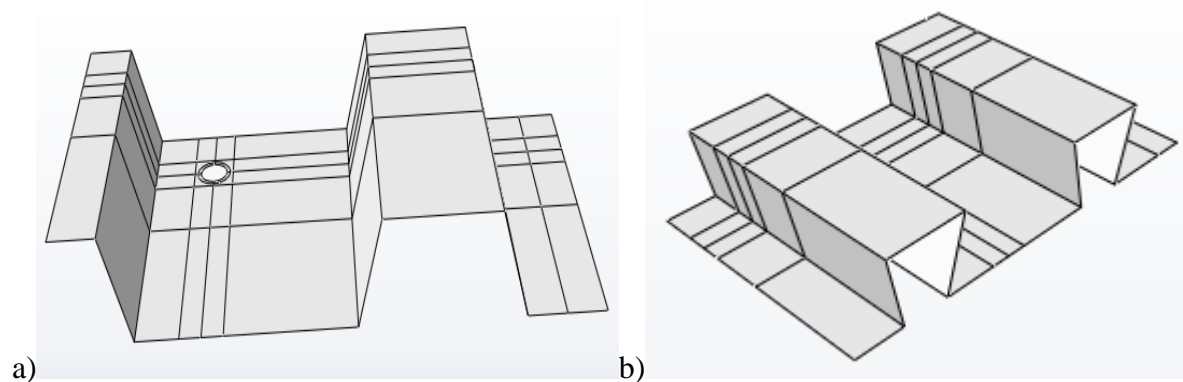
6 Open trough (a) and Re-Entrant trough (b) Profile steel sheeting part
